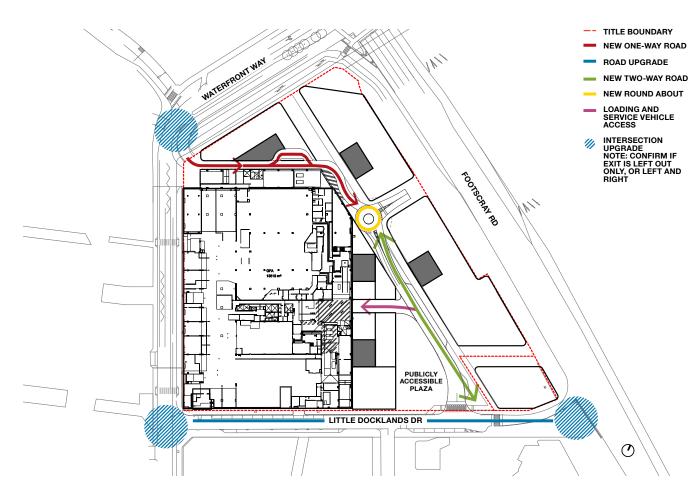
Movement and Parking Plan 3 - Road provision and upgrades
